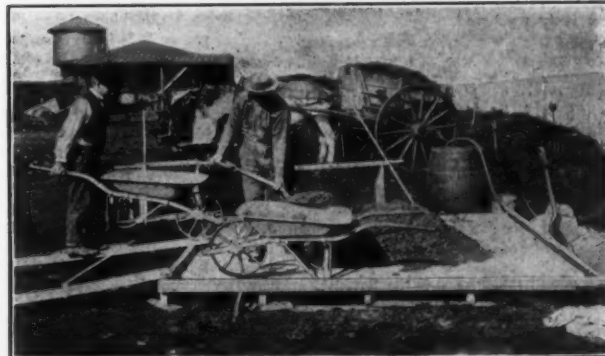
PLACING THE CONCRETE WITH WHEELBARROWS
